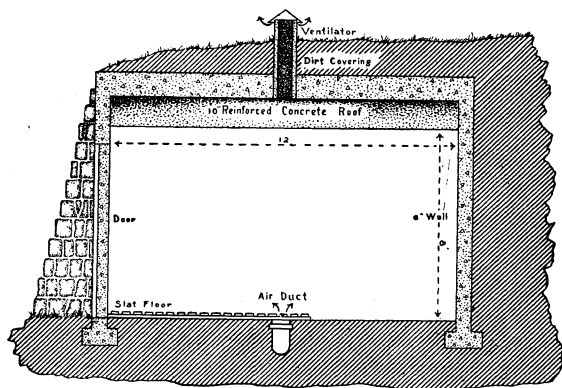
Cross section of a concrete storage cellar, showing the arrangement of ventilators, slat floors, and bins, with provision for the circulation of air under and around the slat floors and bins. This cellar is 10 feet wide and 8 feet high, inside measurement.
